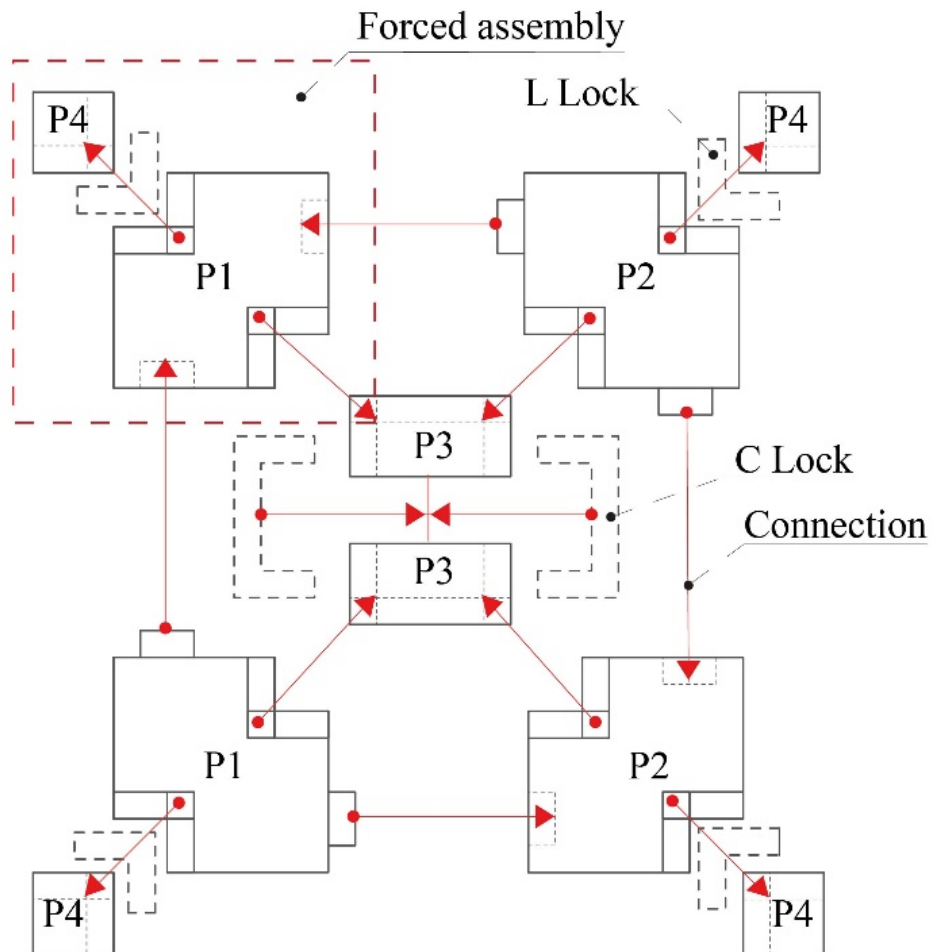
Assembly Technique 2 of Prototypes A₁ and A₂
